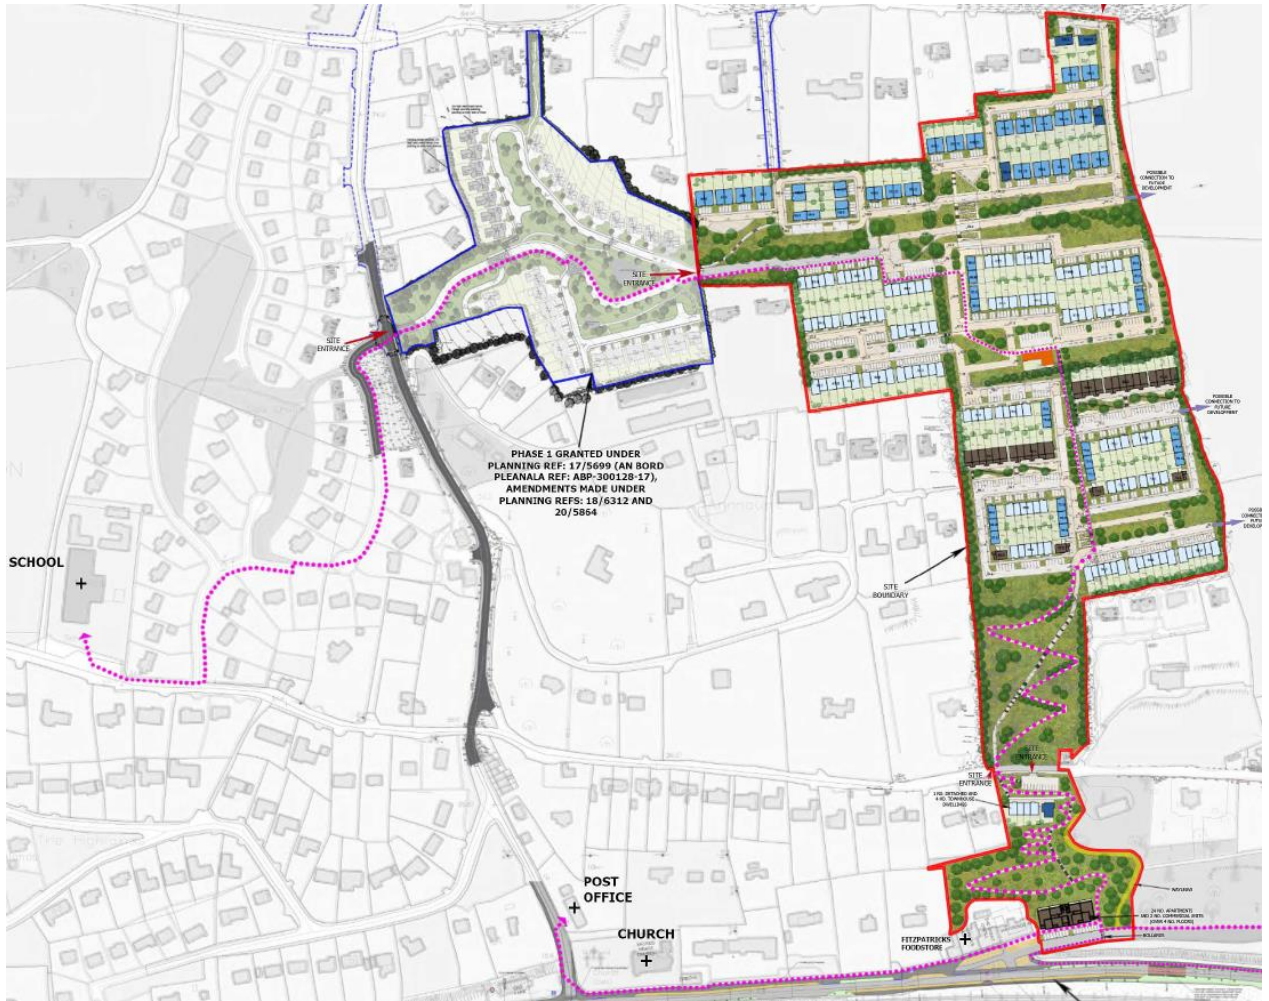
Layout presented at Section 247 Meeting – May 2021
